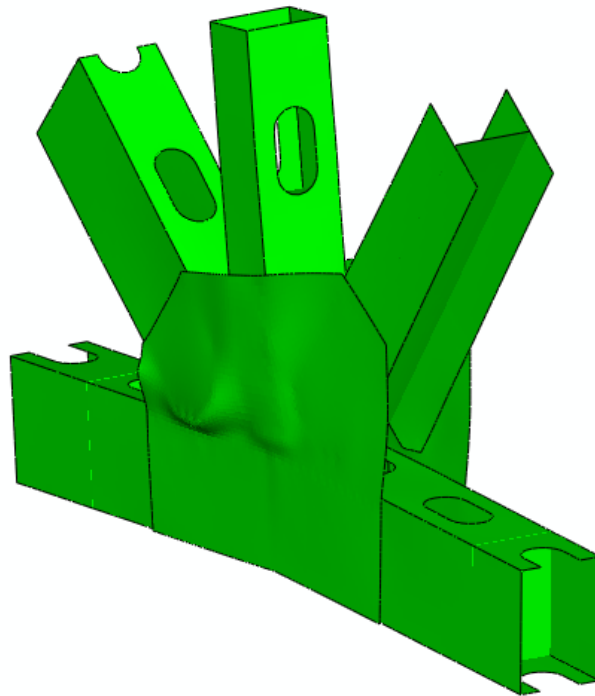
Deformed view of L11W connection with ½ inch, grade100 gusset plates for the construction load amplification scenario (x10 deformation).
